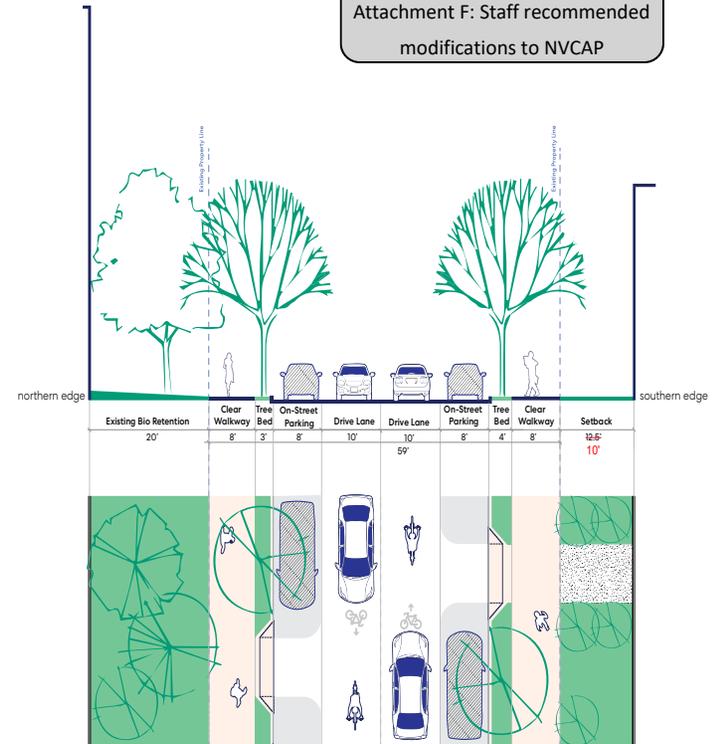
Typical Olive Avenue section between Park Boulevard and Ash Street
